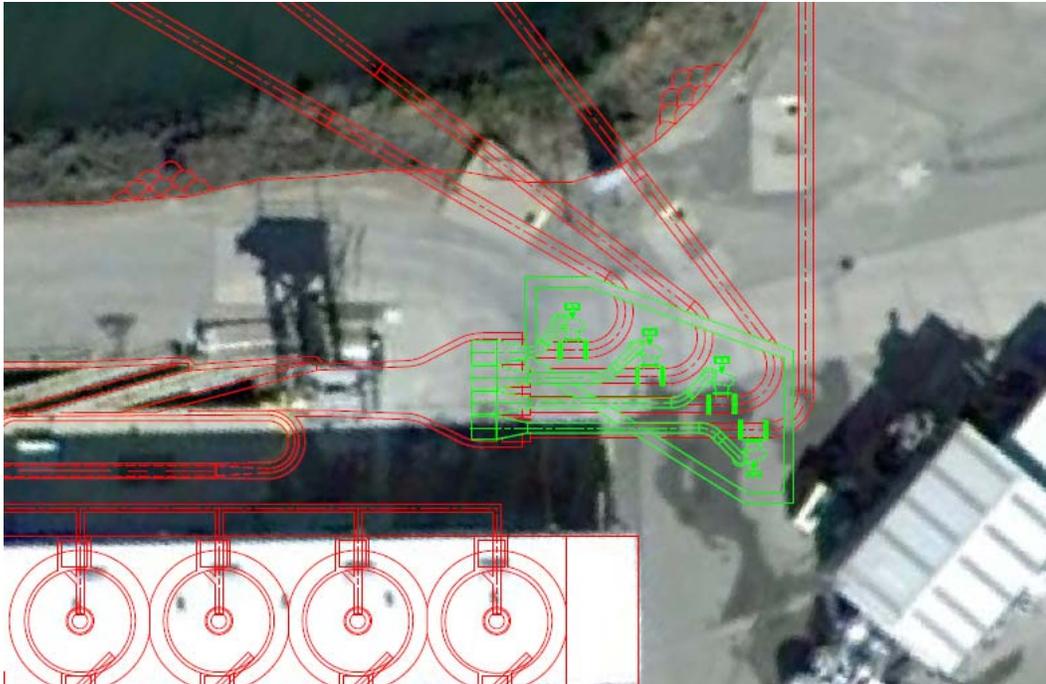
Layout of Alternative 1 at existing TFCF site. Proposed infrastructure is shown in green; existing shown in red
